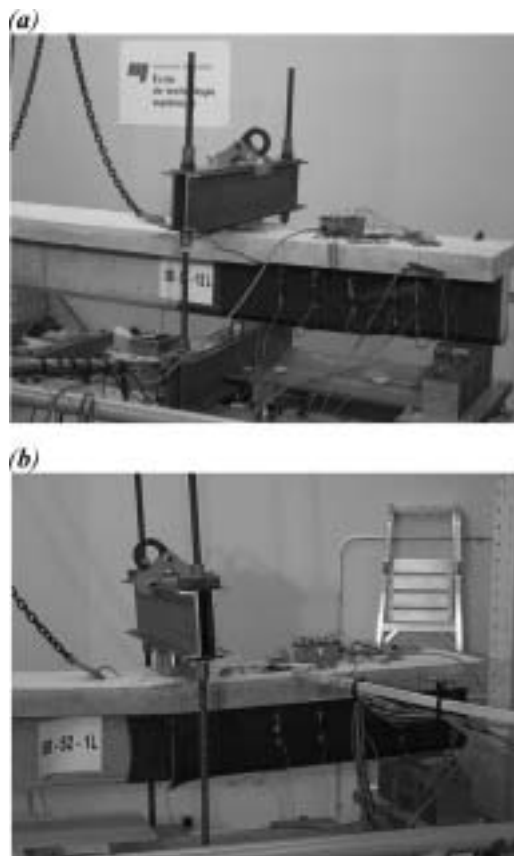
Typical view of specimen at failure: (a) shear failure; and (b) flexural failure.
